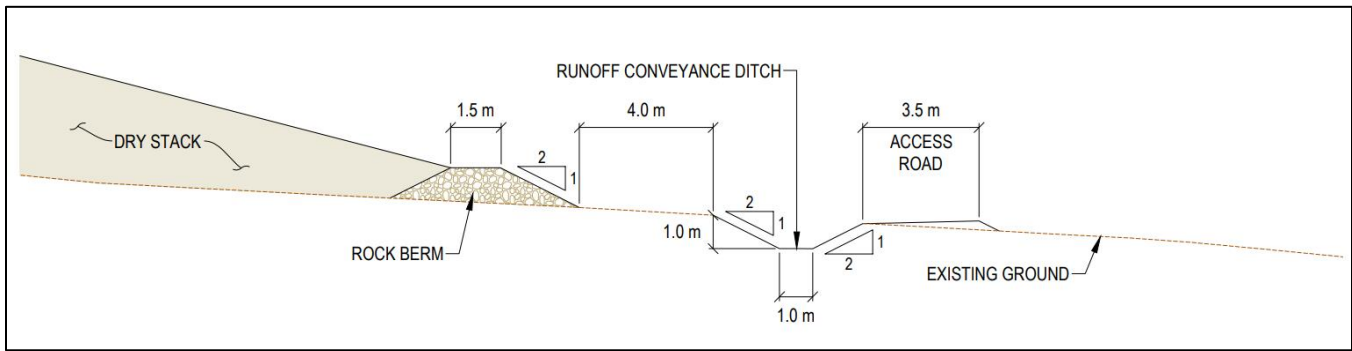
Typical Cross Section of the perimeter dyke along with run-off ditch and access road
